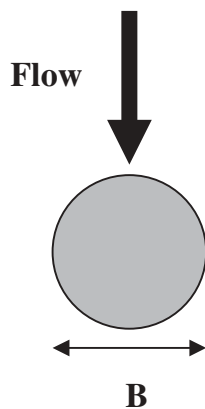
Plan view of single circular pier scour case (Example 1).
